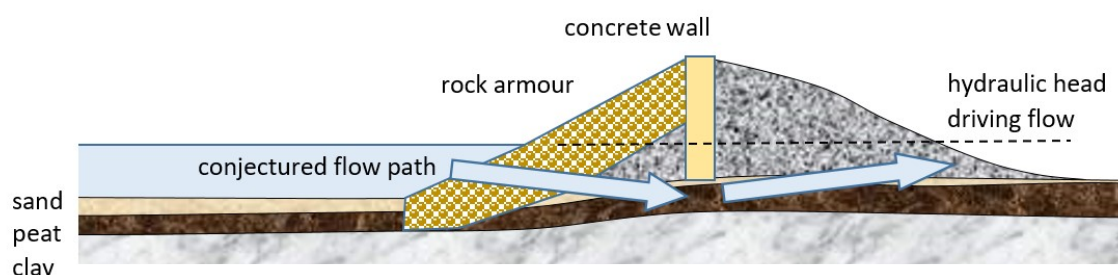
Suggested mechanism of flooding below the road at the caravan park.
